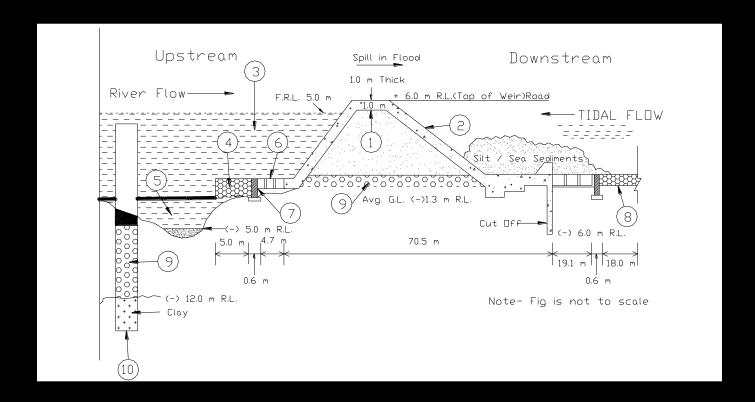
Cross Section of Weir Bays-Showing probability of Piping (weir Surat)
